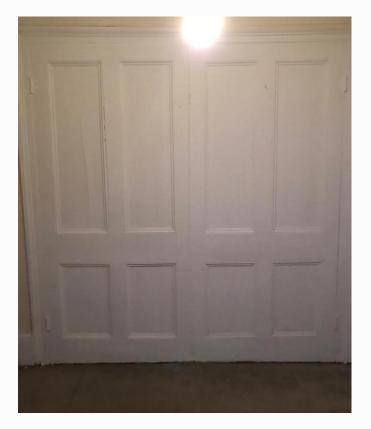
The original four panelled doors that were installed within the spine wall at 1st floor level.
